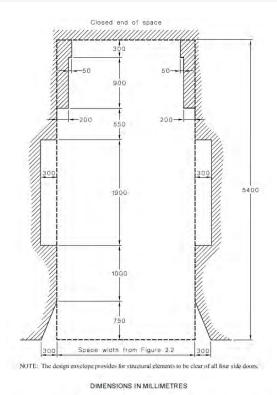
DESIGN ENVELOPE AROUND PARKED VEHICLE TO BE KEPT CLEAR OF COLUMNS, WALLS AND OBSTRUCTIONS
